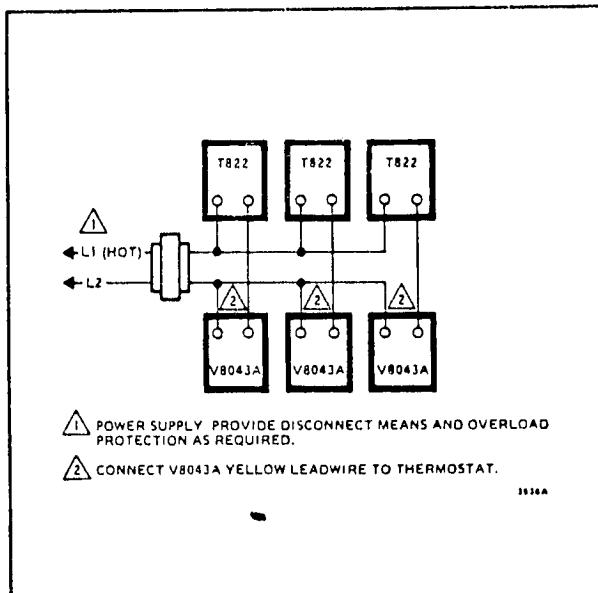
T822 THERMOSTAT, V8043A VALVE HOOKUP.
